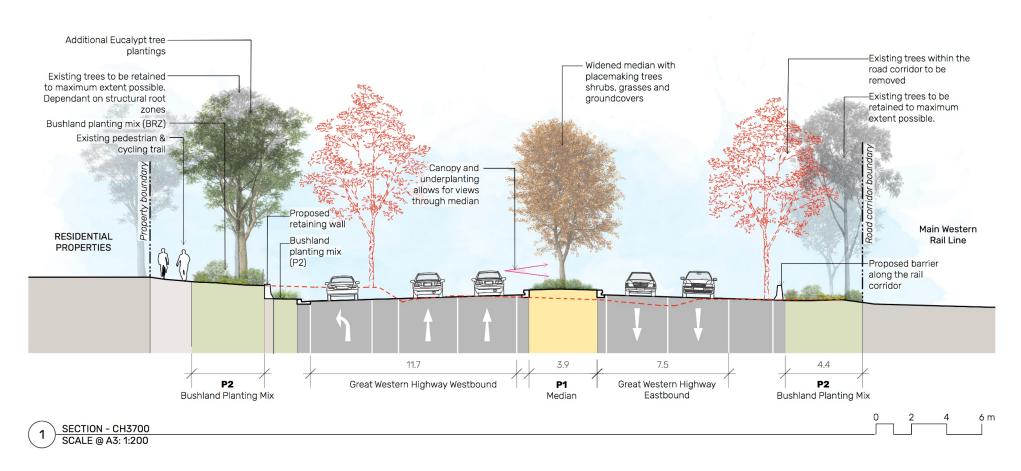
Typical cross section within southern section of proposal - south of Bellevue Crescent showing left turn lane (SMM, 2021)
